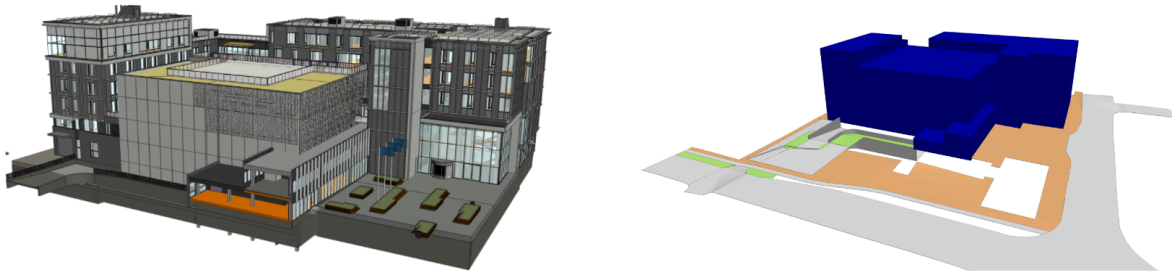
Example of a BIM model of building design (left) and a BIM model of a detailed plan (right)
